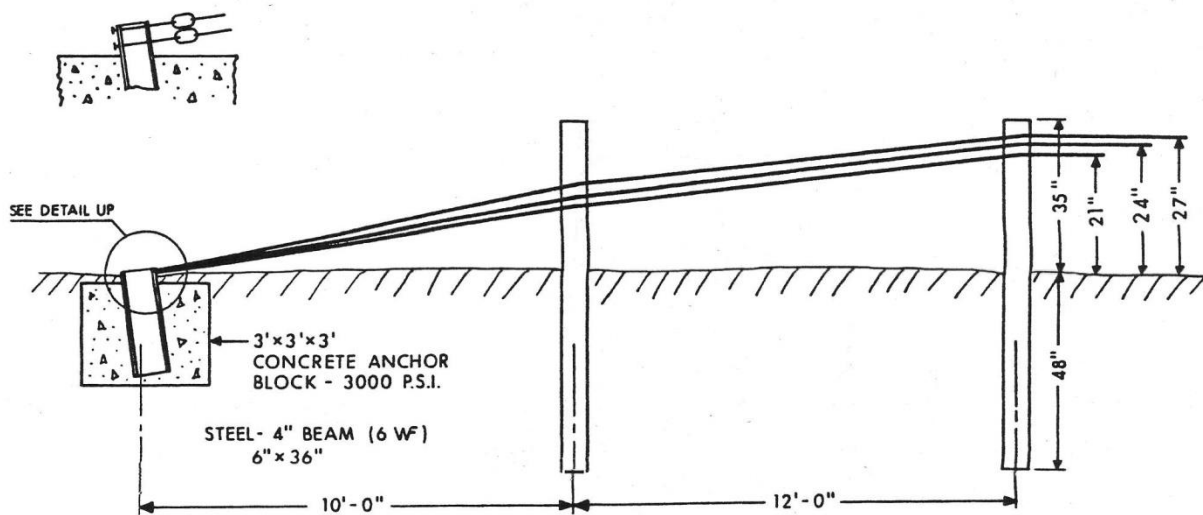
Canadian Department of Highways "Concrete" Anchor Details, 1967 [19]
